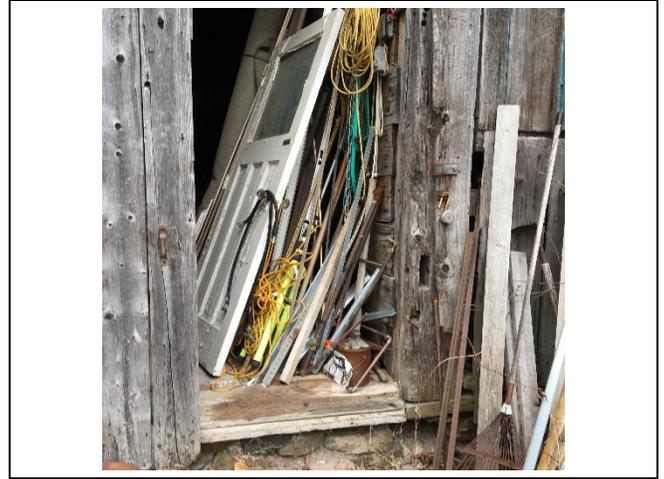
The condition of the lower portion of the sliding door appears to be consistent with the pre-construction initial assessment.
